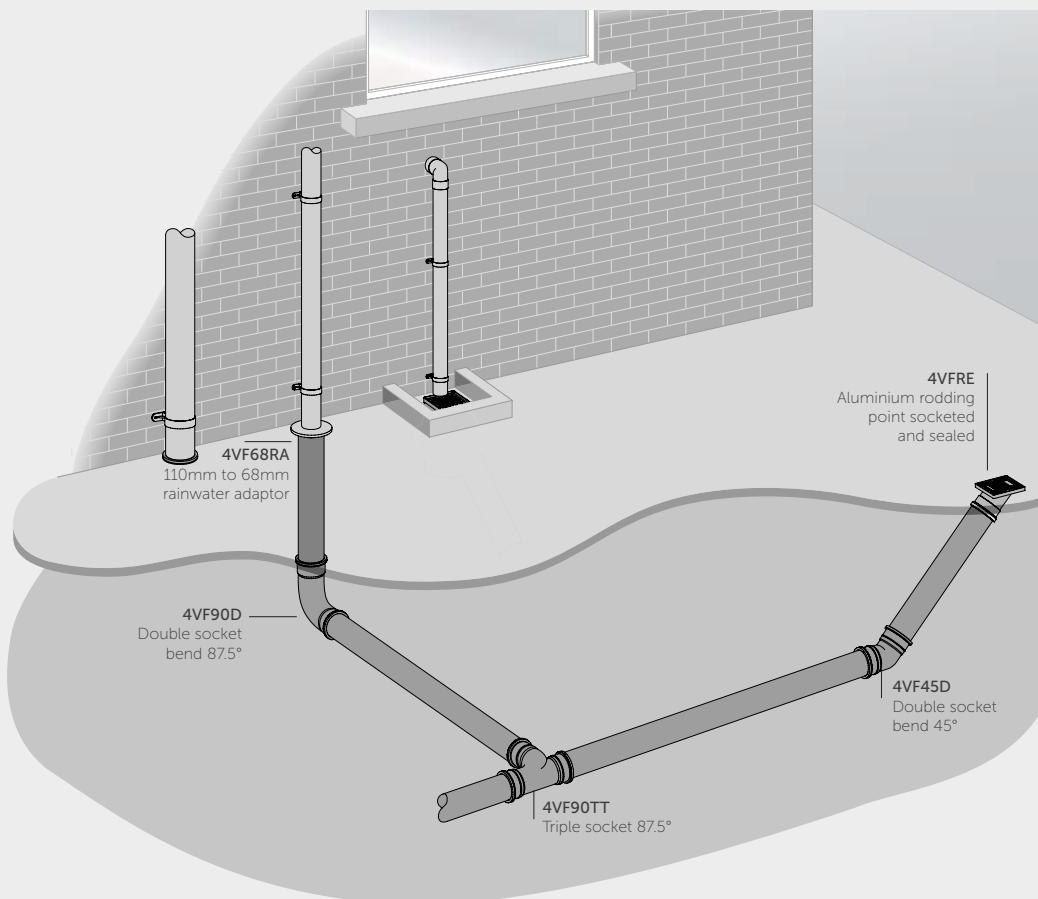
TYPICAL LAYOUT USING RODDING ACCESS COMPONENTS
